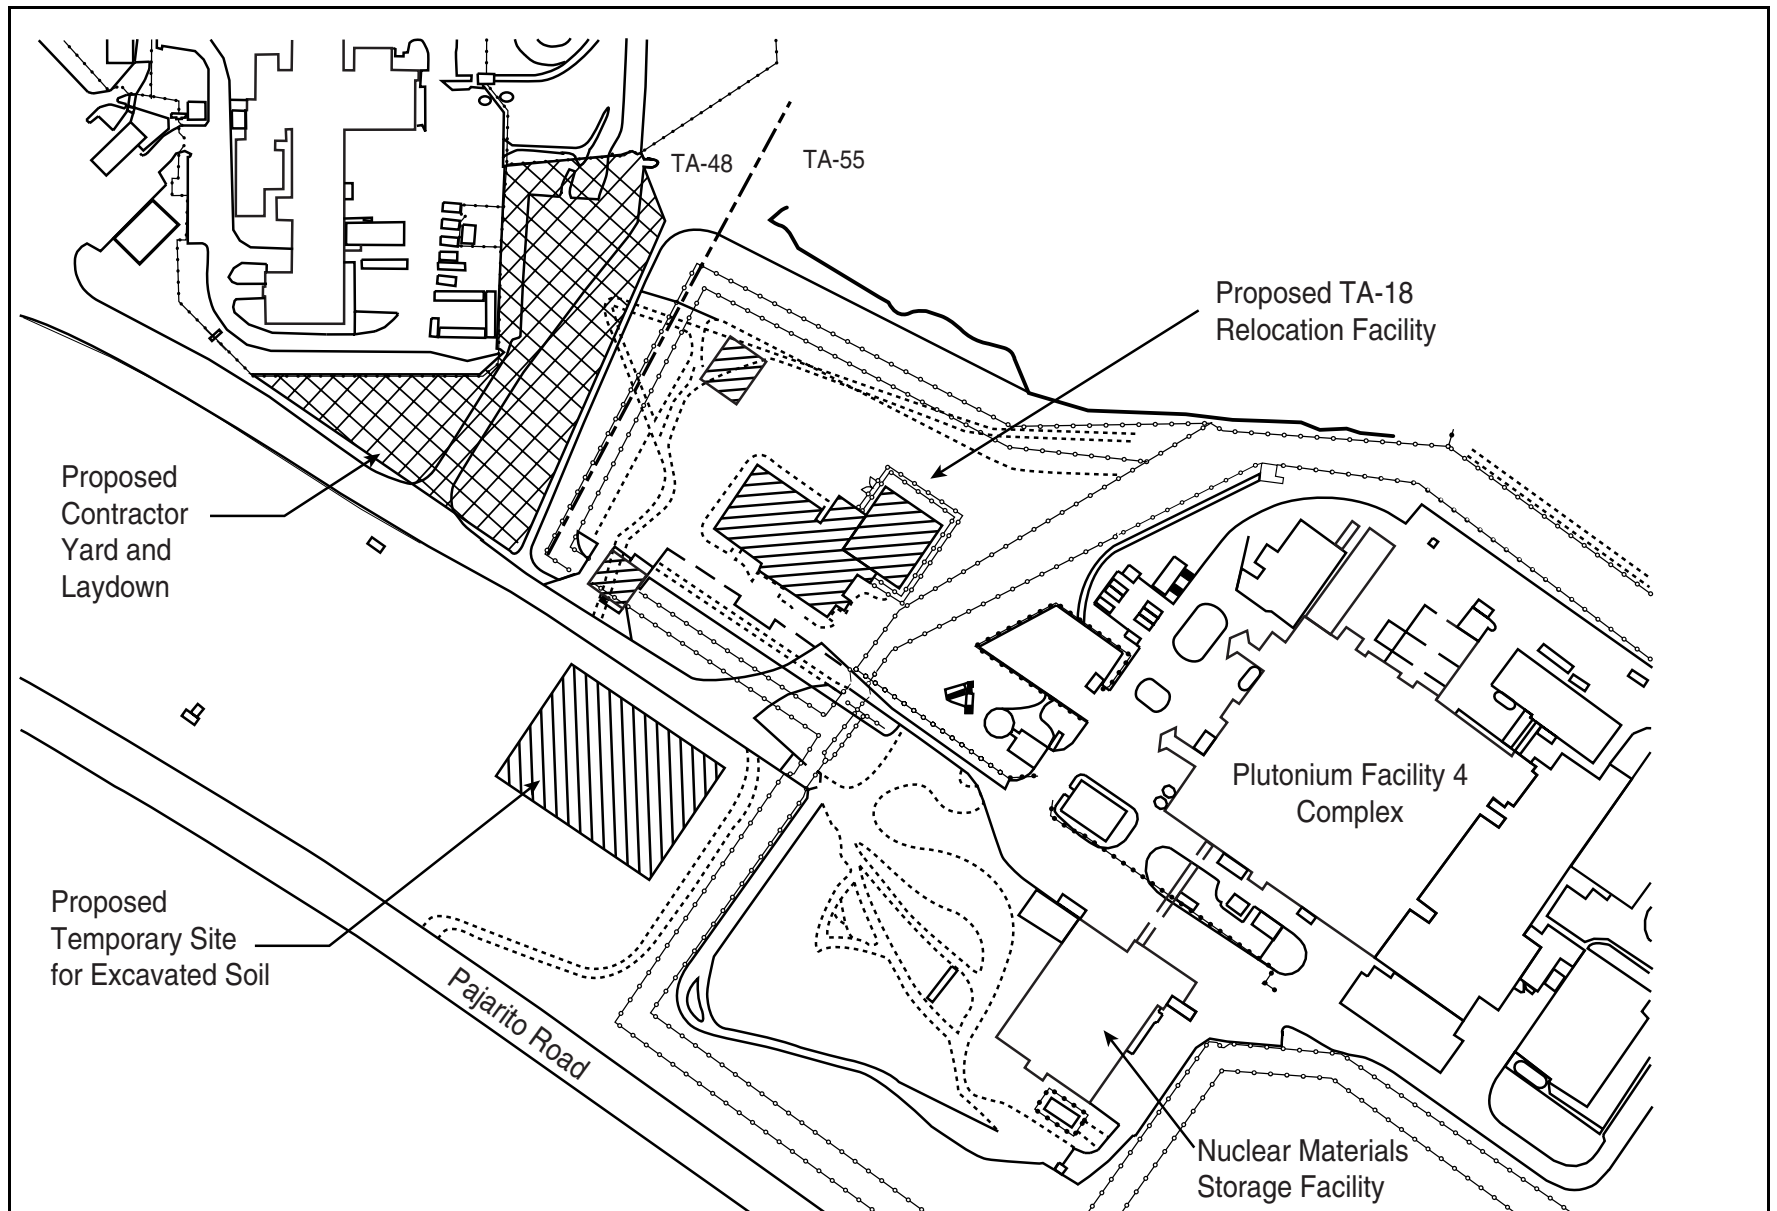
Location of the Proposed New Facility (LANL New Facility Alternative)
